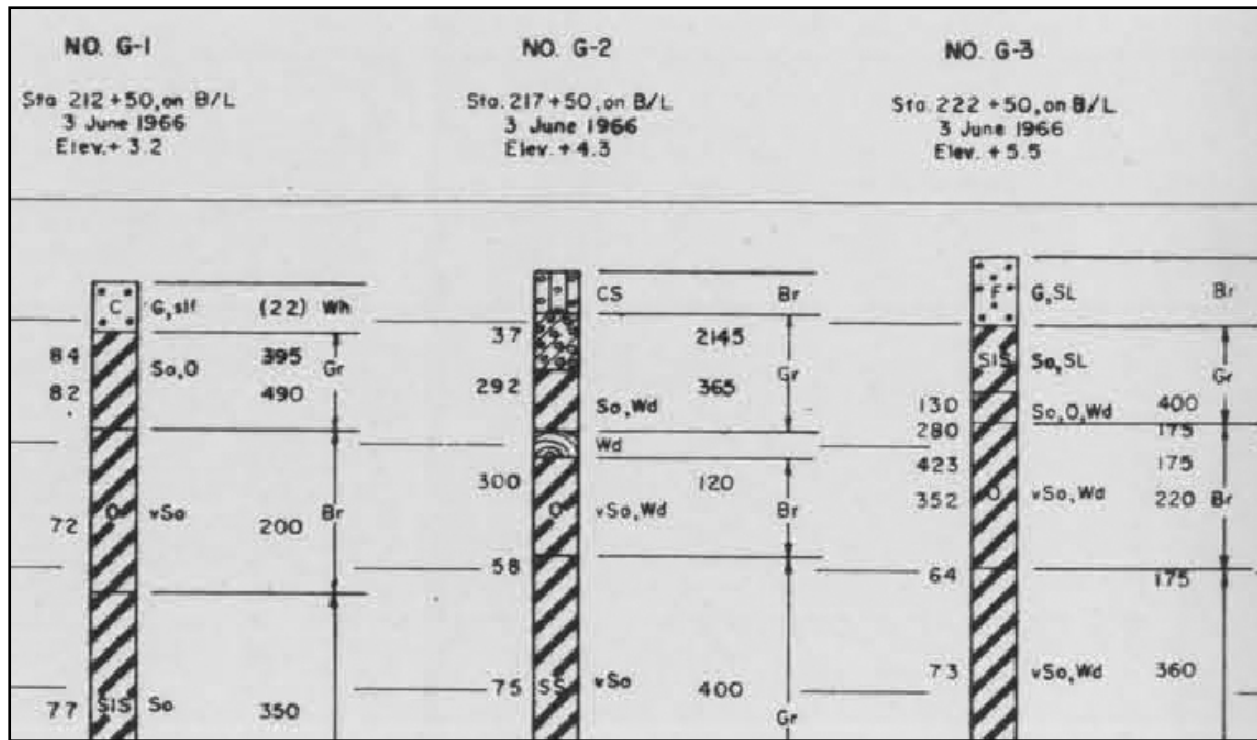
Nearest Boring, G-3, Shows Original Ground at Elev 5.5 ft is Sandy Soil
